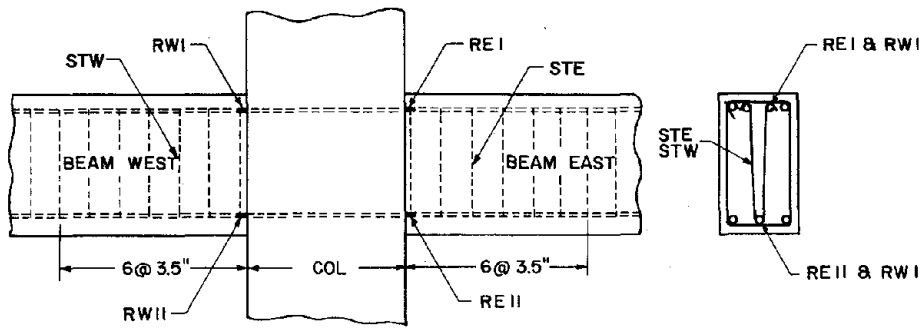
Locations of Weldable Gages on Longitudinal Rebars and Stirrups
